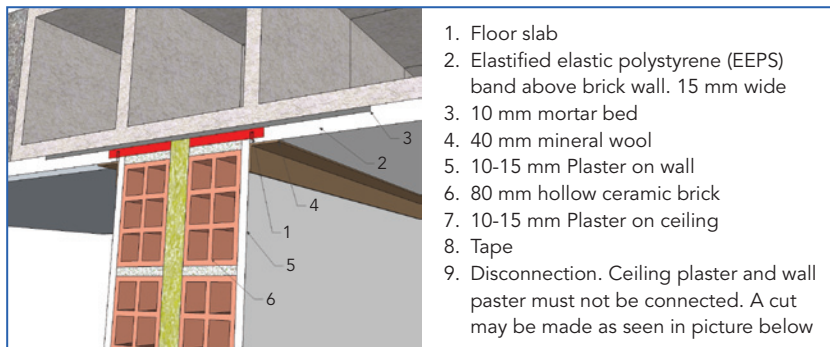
Detail of disconnection between the plaster finish of the wall and the plaster finish of the floor.
